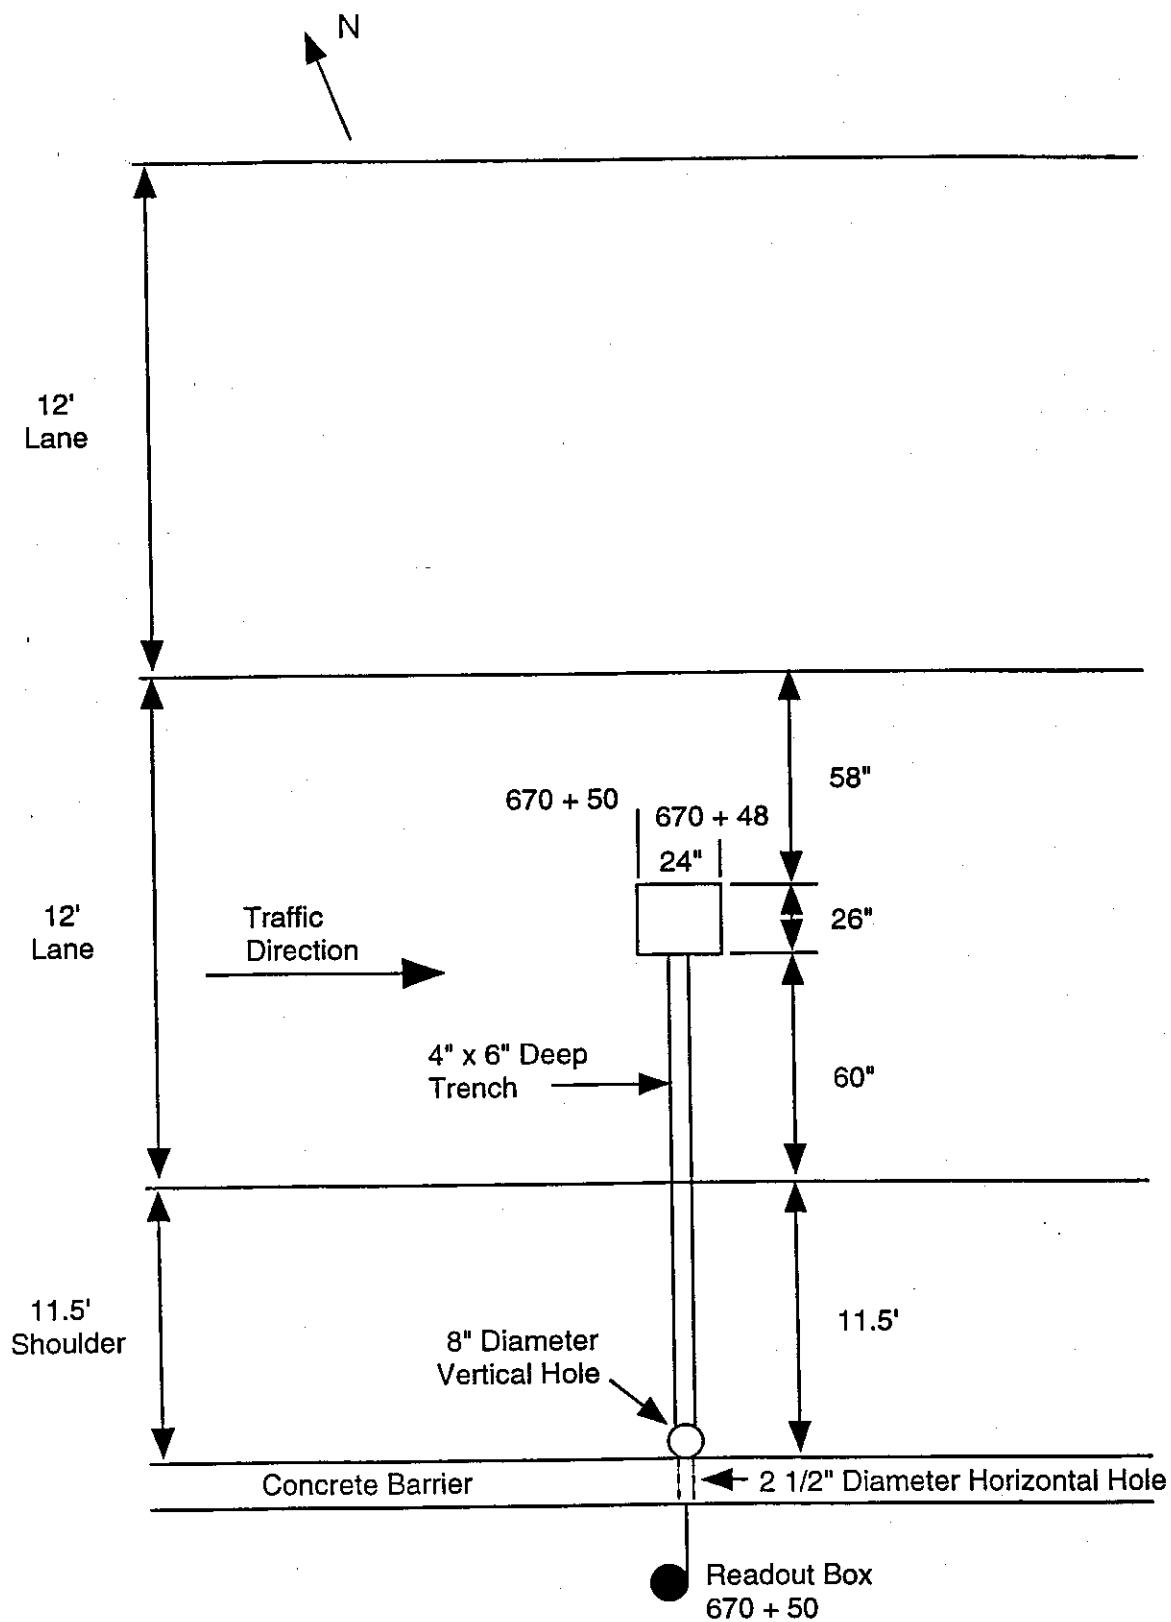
Plan View of Site 1 - Cement Treated Base
